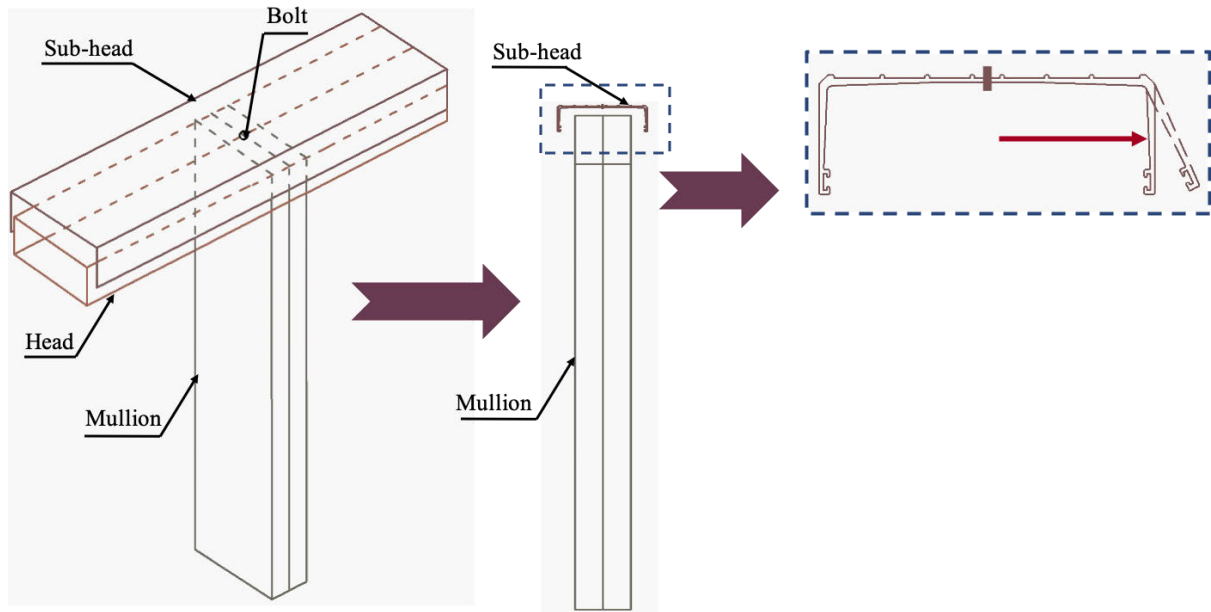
Bearing failure of the sub-head under concentrated load.
